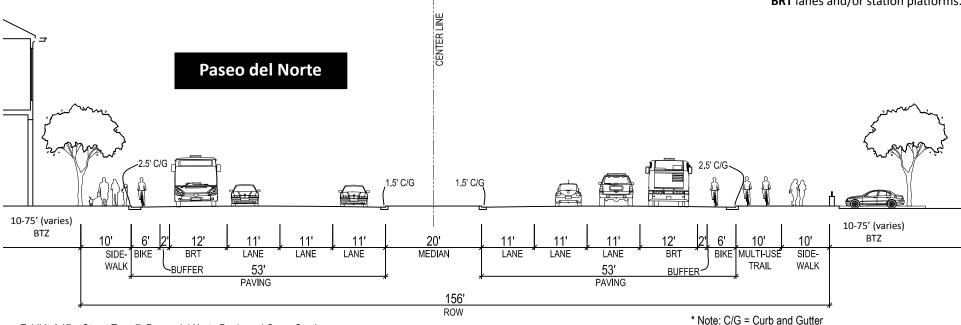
Street Type 7: Paseo del Norte Boulevard Cross Section
